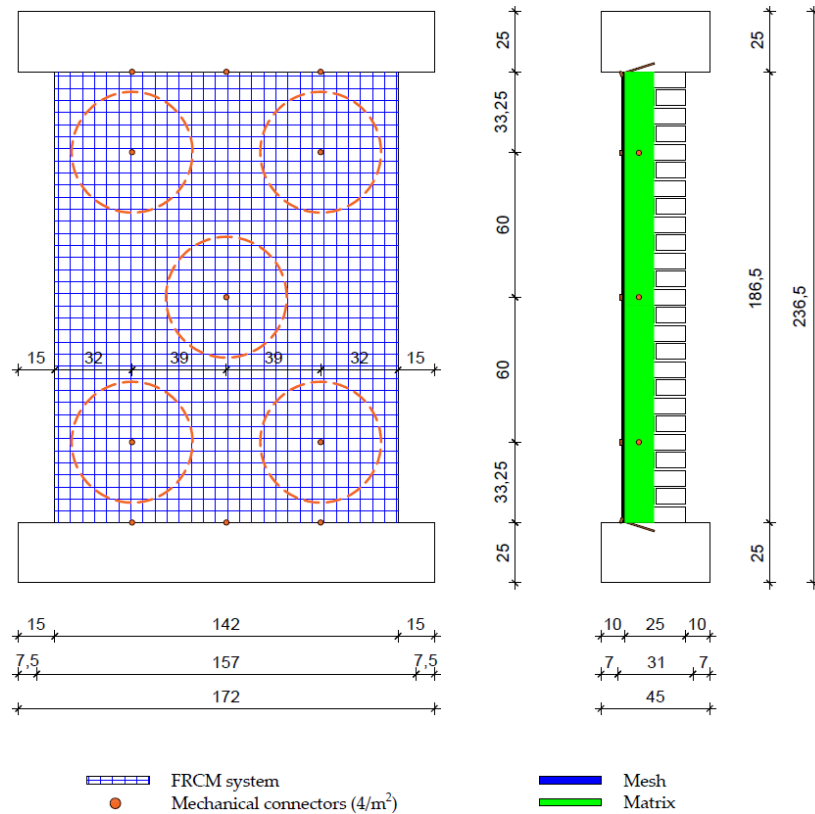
Single sided FRCM strengthening with clamping details (CFRCM) – Series 3 – front and side view
